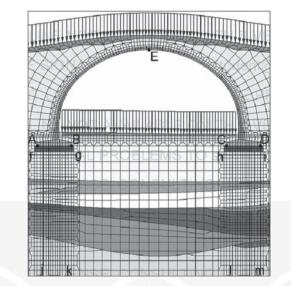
Scheme of FEM mesh of the tunnel foundation on jet-grouting columns
